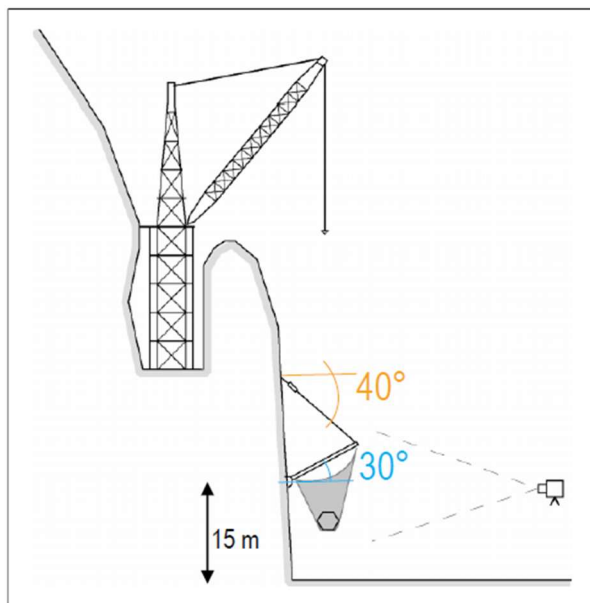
Walenstadt vertical drop impact test: geometrical configuration for the barrier (Marchelli M. , 2020).
